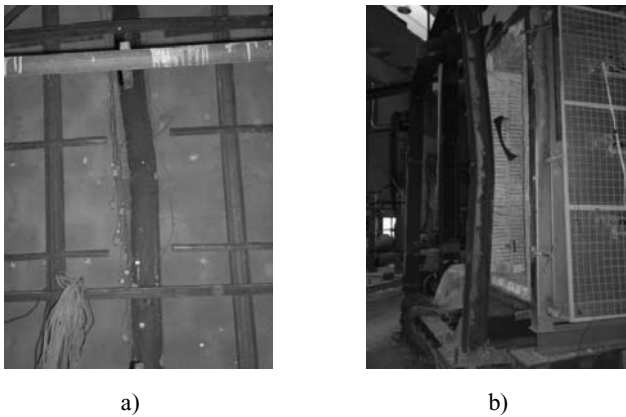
Column E02 after test - web perpendicular to wall – wall thickness 140mm - HEA 160
